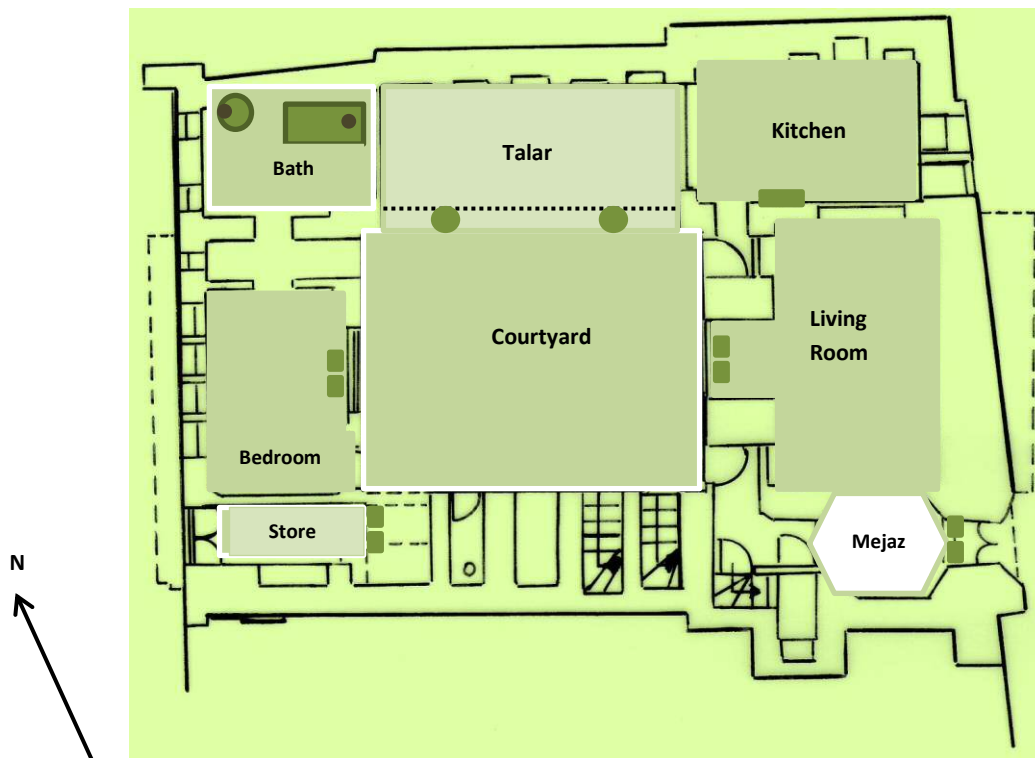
Ground floor level plan of traditional courtyard house No. 6. Scale: 1:50
